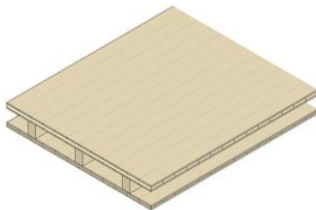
Closed CLT rib floor Stora Enso (*Rib Panels, n.d.*)
